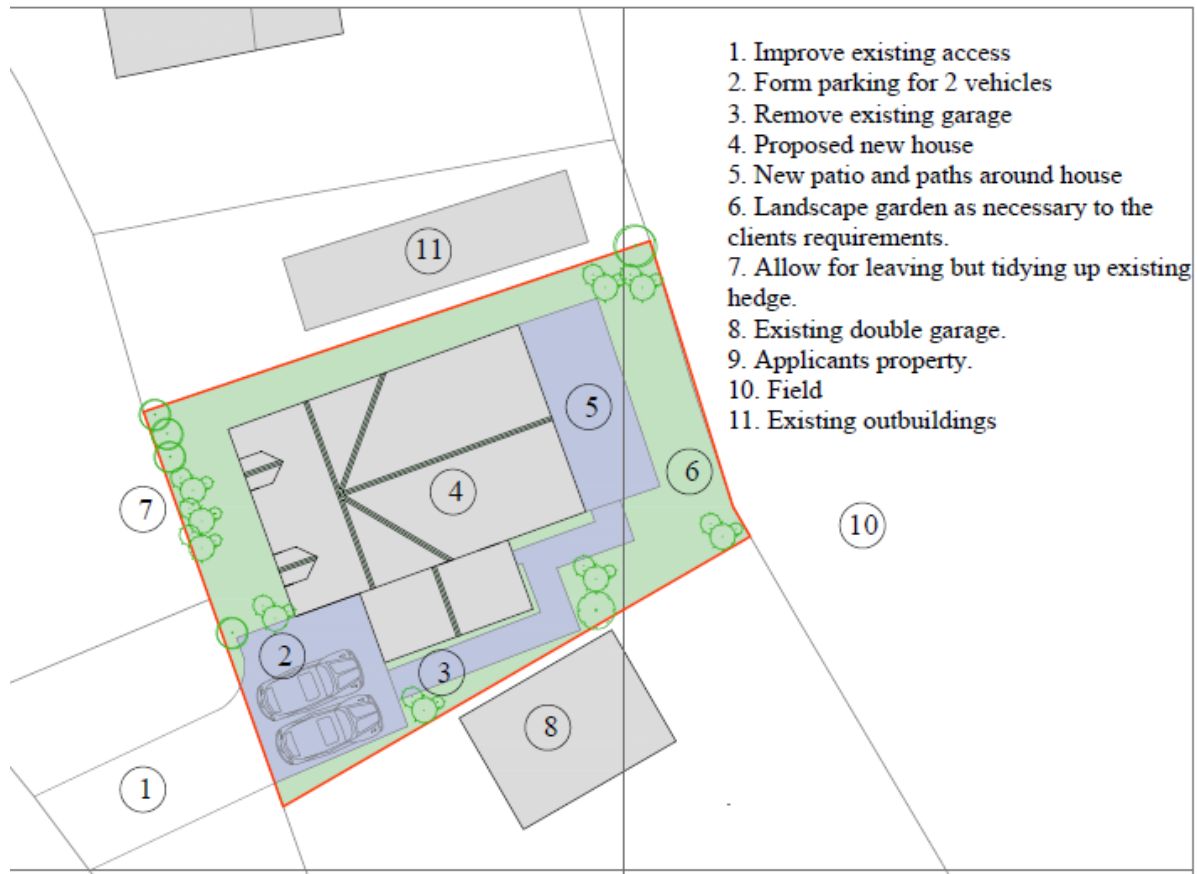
Extract from AH073-P02(A) Site Layout Plan (Source: Aidan Hume Design)
